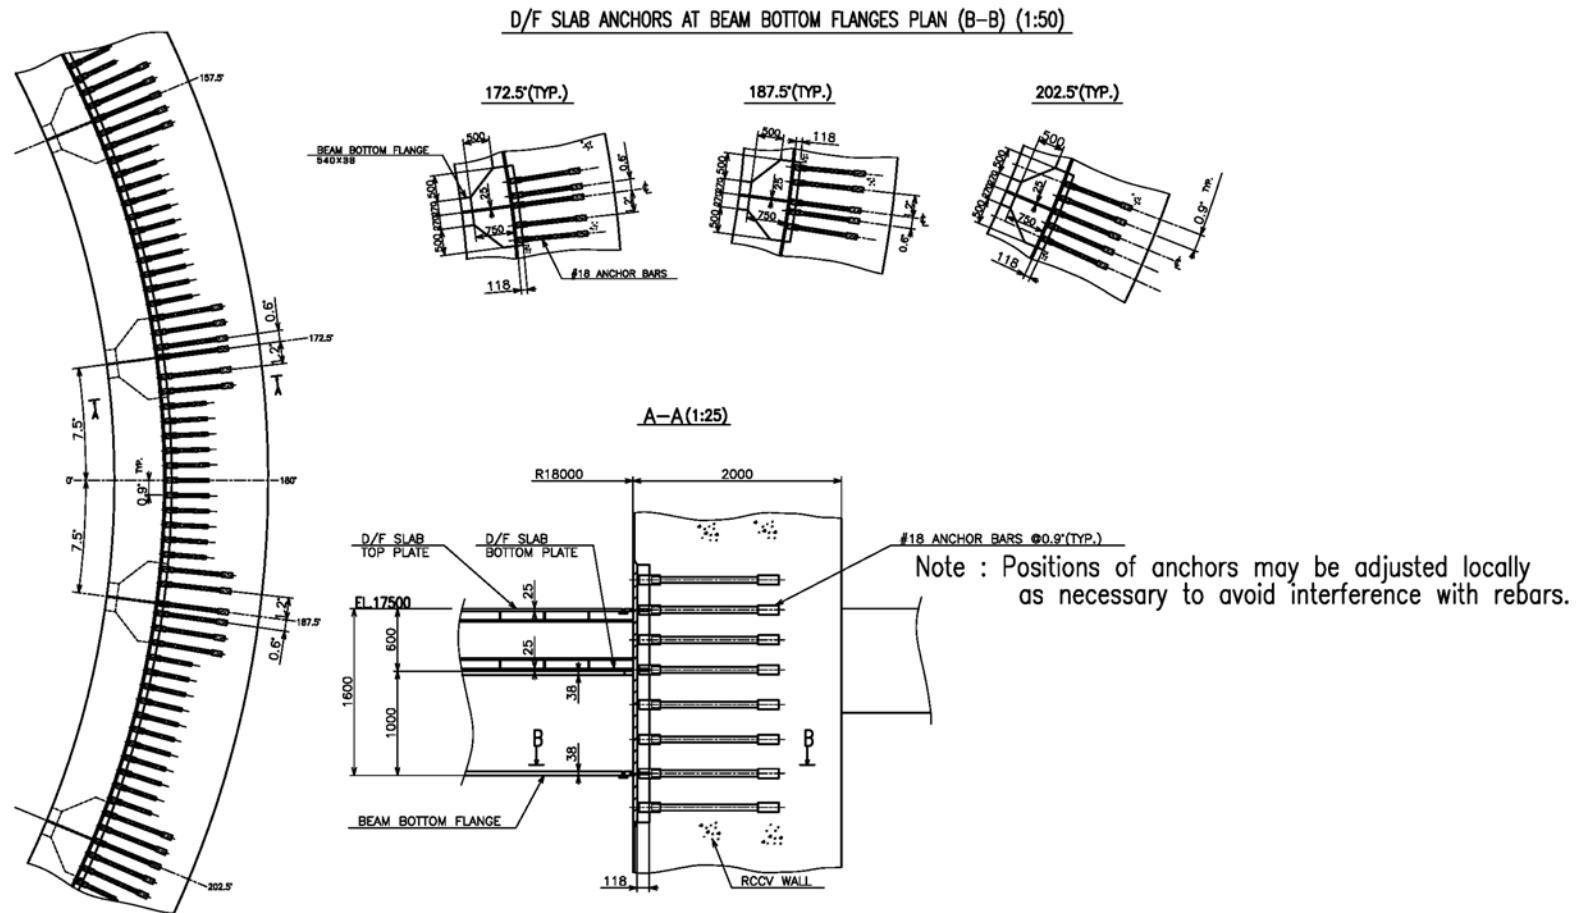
G.1-56. Diaphragm Floor Slab Anchor
